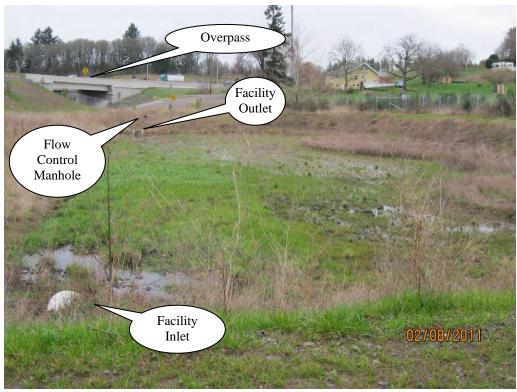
Facing northeast along facility. Metal inlet pipe at the bottom of photo. (Black plastic inlet pipe off to left not in photo.) Outlet beneath overpass (SE Fairview Industrial Drive and I-5 (Hwy 001)) at top of photo.
